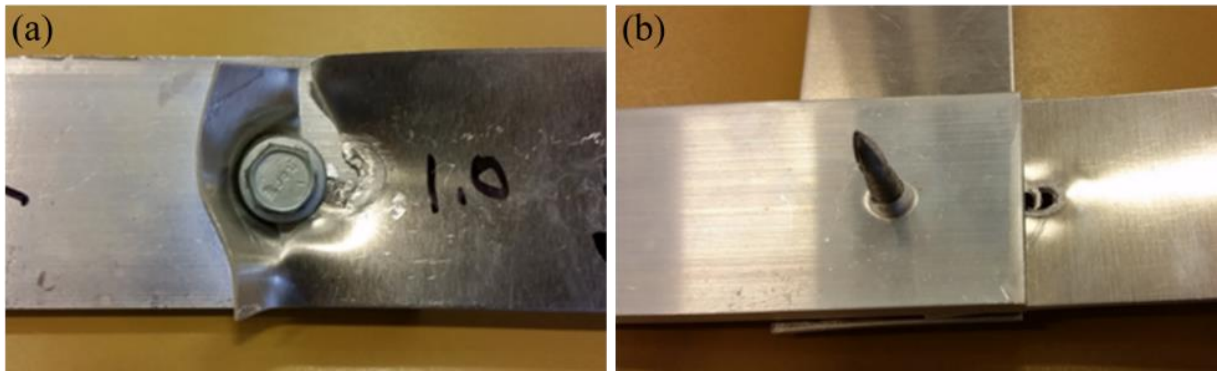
Sheet tear-out failure mechanism (a) top sheet of 2T, (b) middle sheet of 3T
